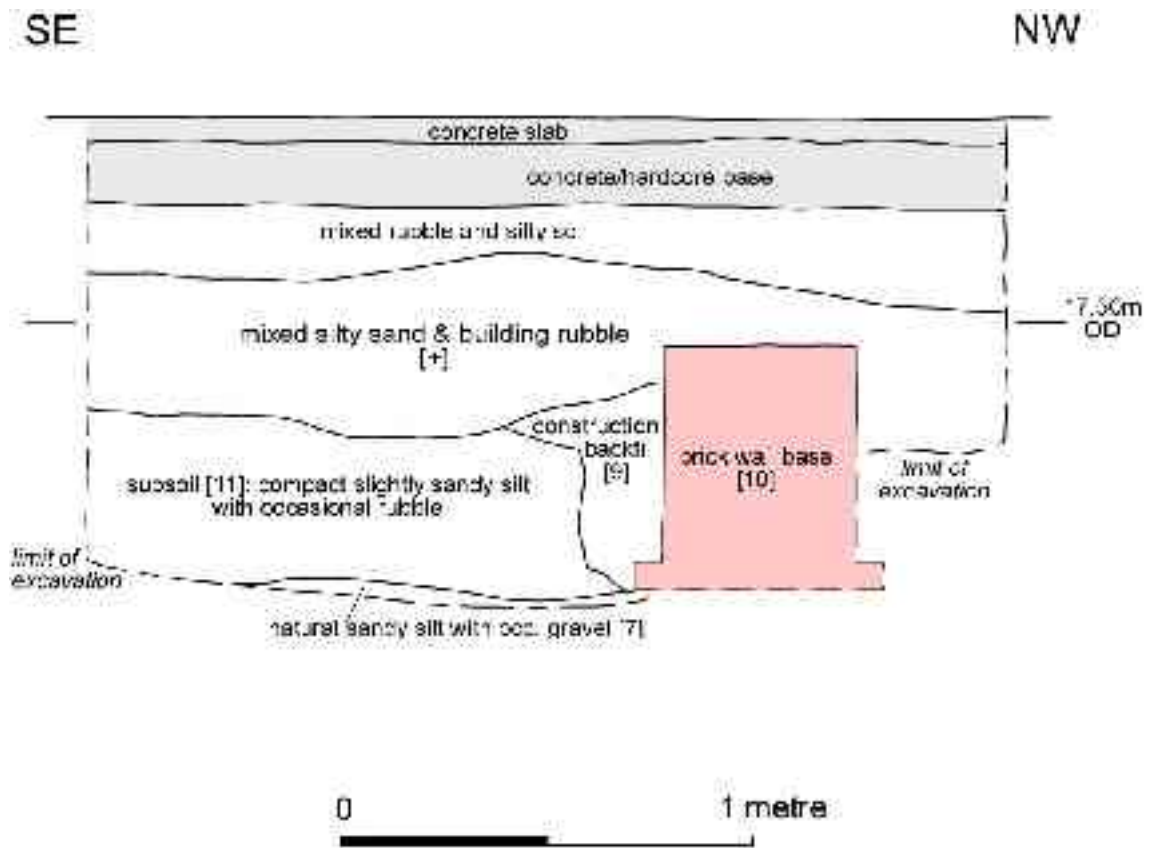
Southwest section of Test Pit 1 after full excavation (located on Figure 6)
